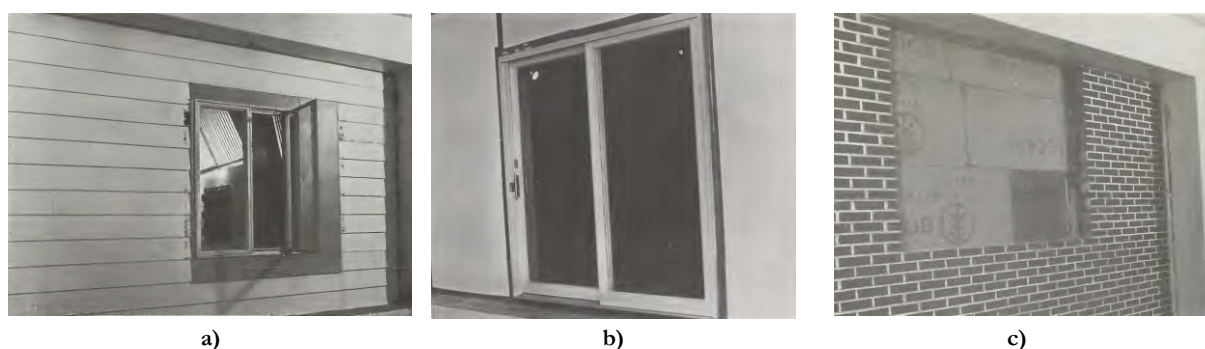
Walls specimens tested on the calibrated hot box apparatus: a) plastic-coated wood wall with window; b) plastic-coated wood wall with sliding glass door; c) brick veneer wall with the opening cut for window [159].
